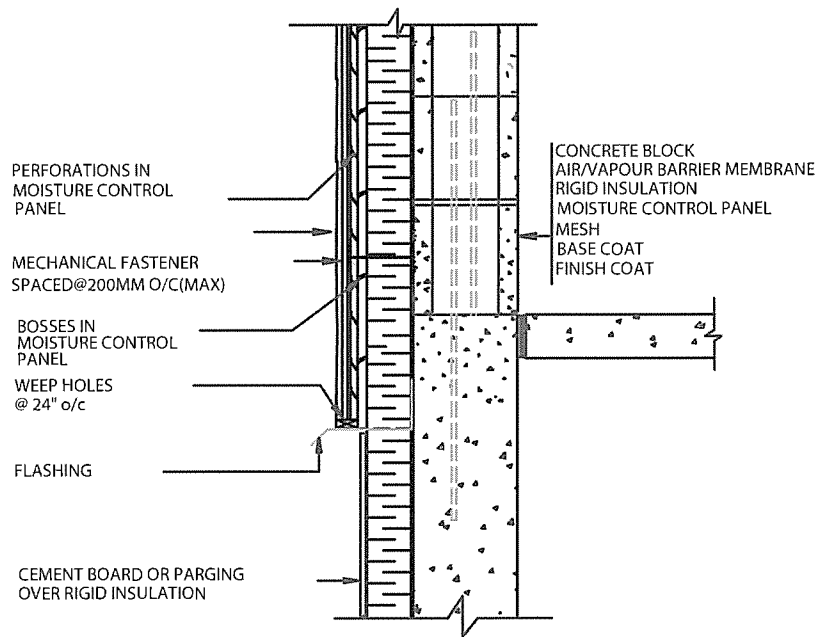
ACRYLIC STUCCO / CONCRETE BLOCK
